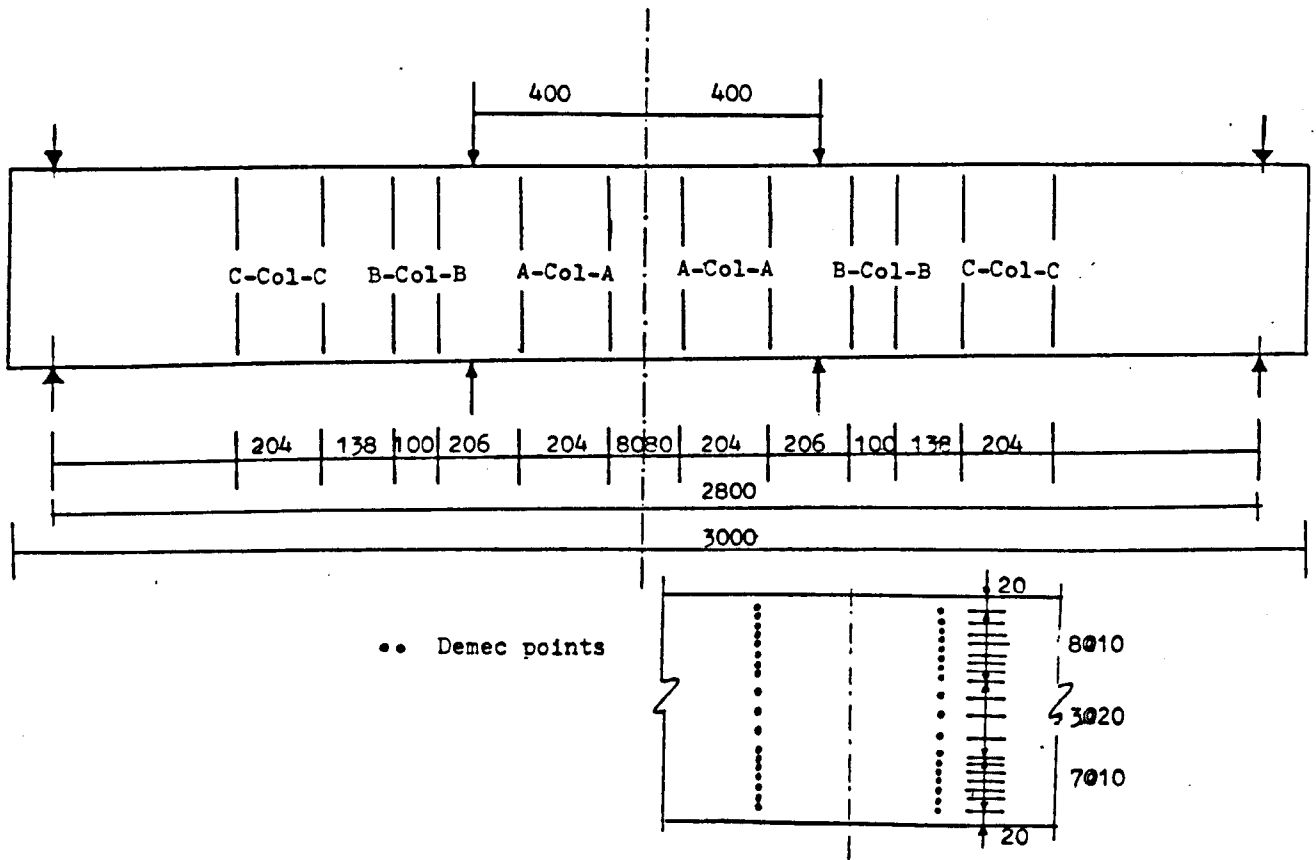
Static tests-reverse bending test beams; details and distribution of Demec point columns on concrete surface.
